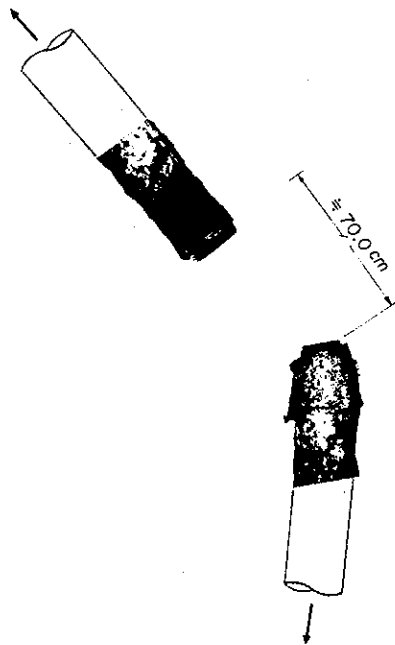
Damage to welded steel gas pipe to point A
